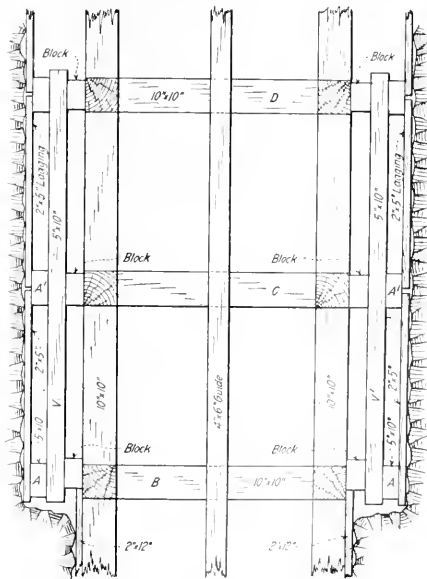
SECTION OF SHAFT BEFORE REMOVING SET C.
